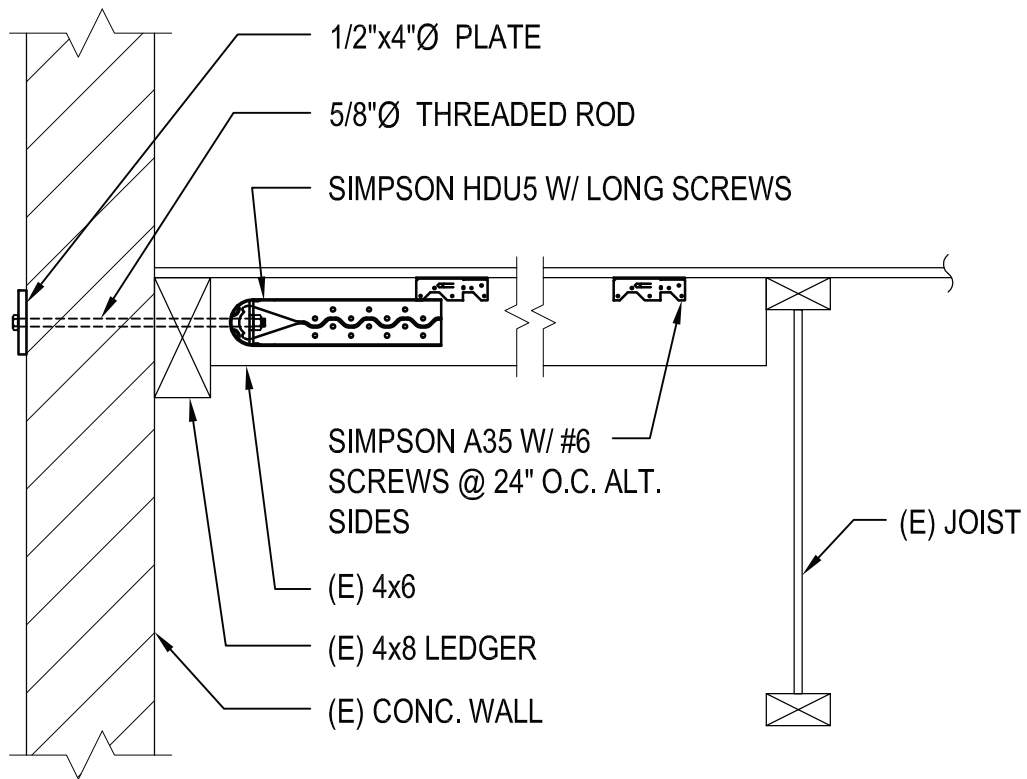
Wall Anchorage, Perpendicular to Joists
